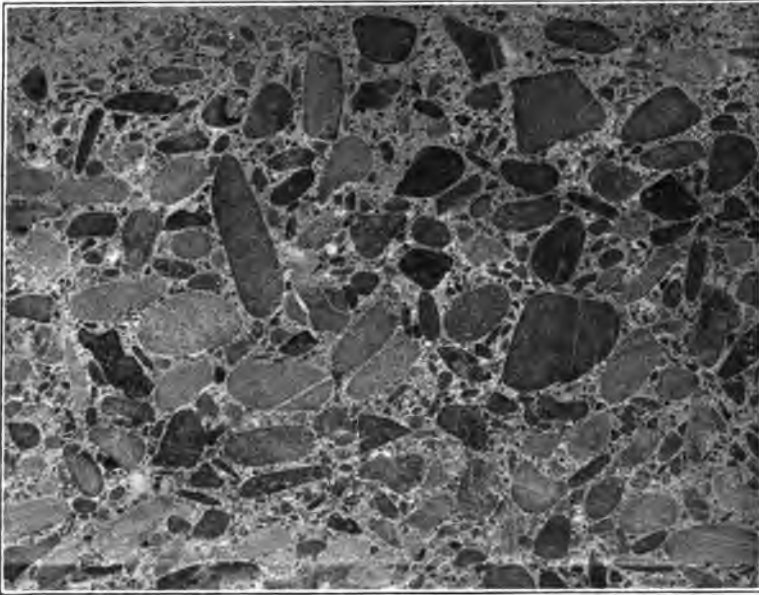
Fig. VI. Cross-Section of Concrete for Platforms—Southern Pacific Co.
